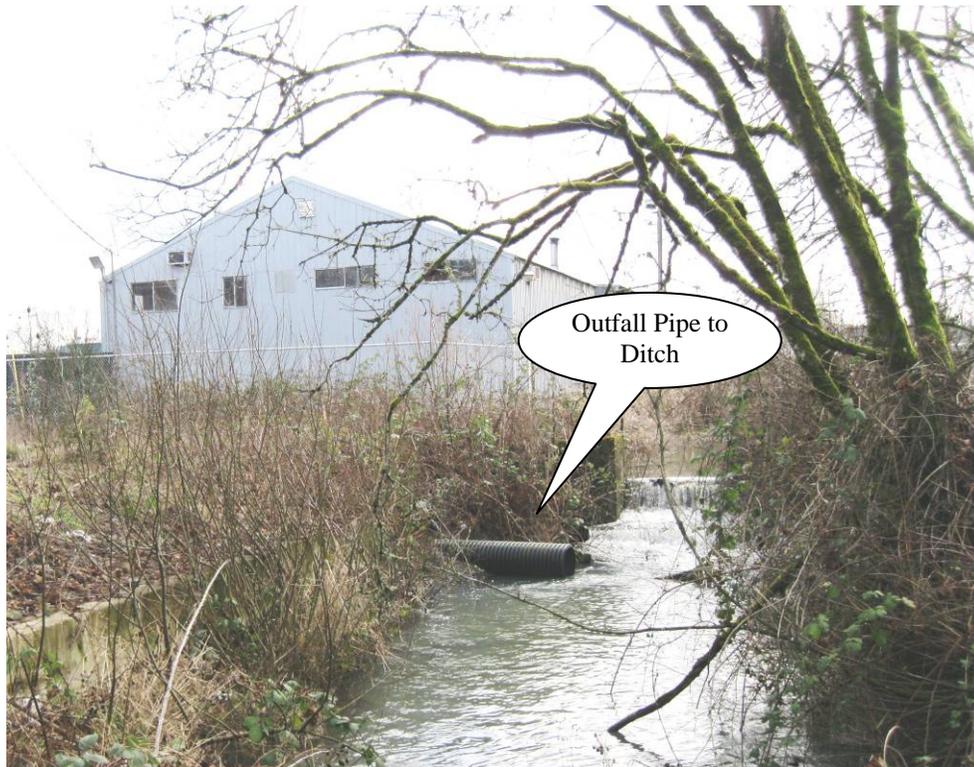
Outfall pipe to ditch (Point D on Operational Plan in Appendix A.) Photograph taken facing southeast. (U.P.R.R. to right (south) not pictured.)
